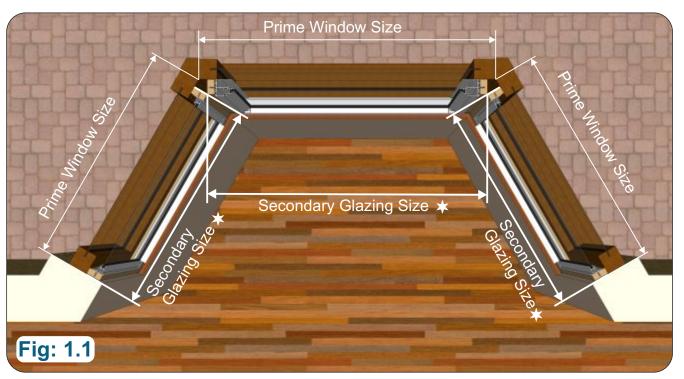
Shows a cut through of a faceted bay window with secondary installed.
